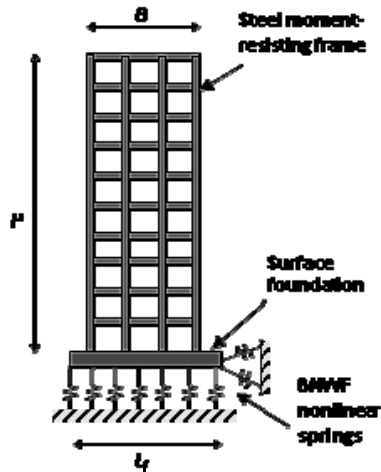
Schematic diagram of soil-foundation-structure system using BNWF model
